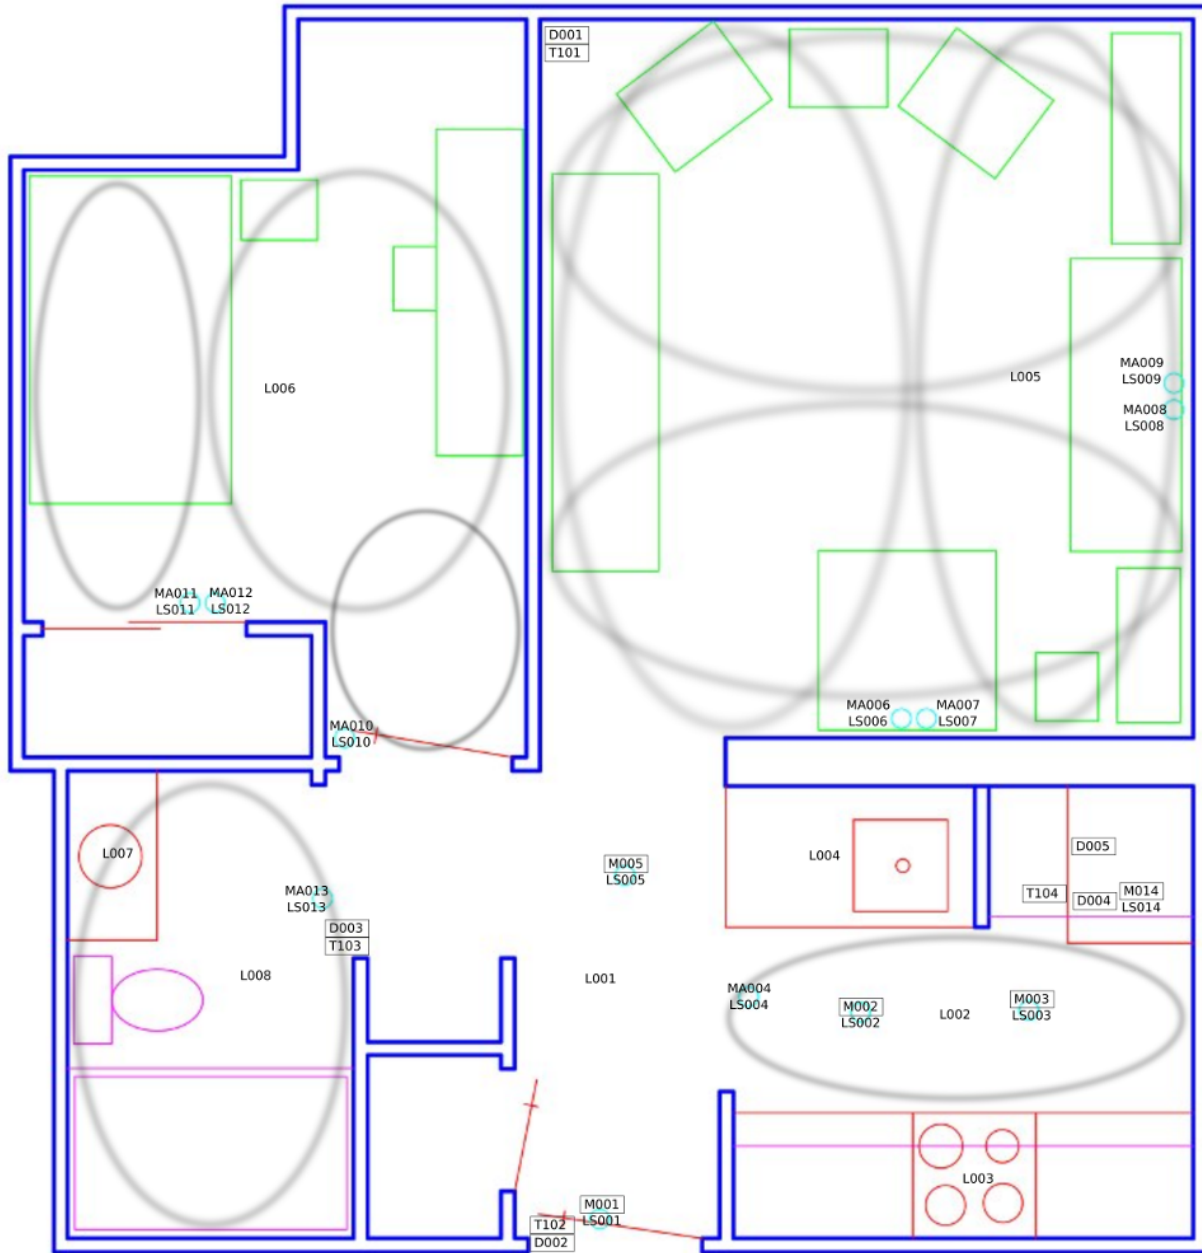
Floor plan and sensor placement for the testbed hh14.
